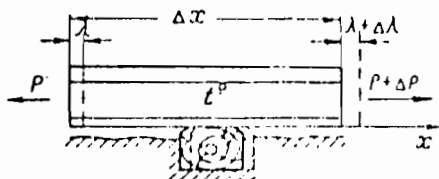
Equilibrium conditions of an element of a string of welded rails
